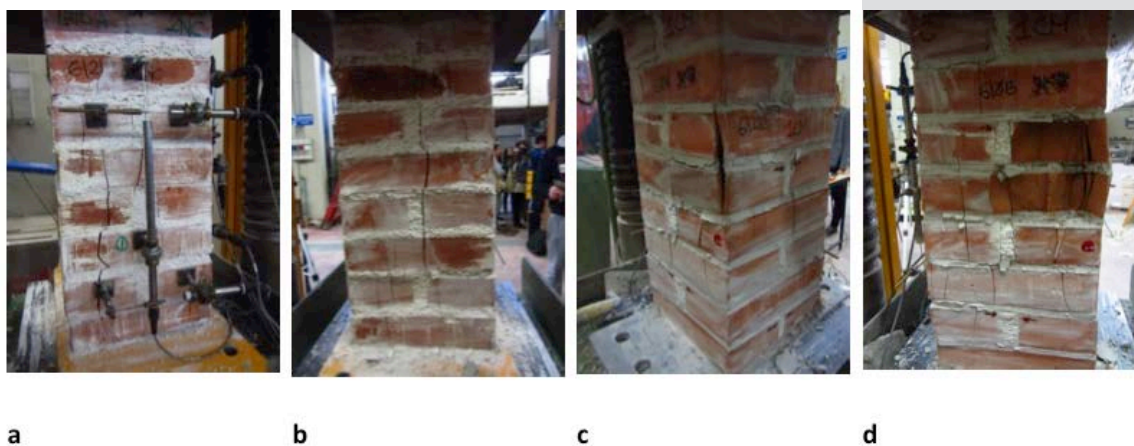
Example of the crack pattern (failure mode) of an unconfined column (a and b) and of a reinforced column (c and d).
